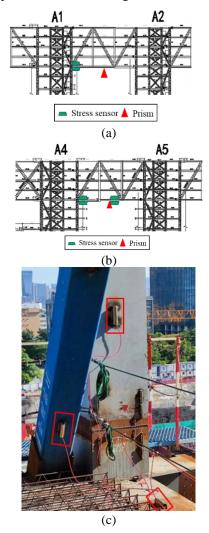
Stress sensors and Prisms on truss. (a) truss between A1-A2, (b) truss between A4-A5 and (c) sensor installation diagram (in red box)
